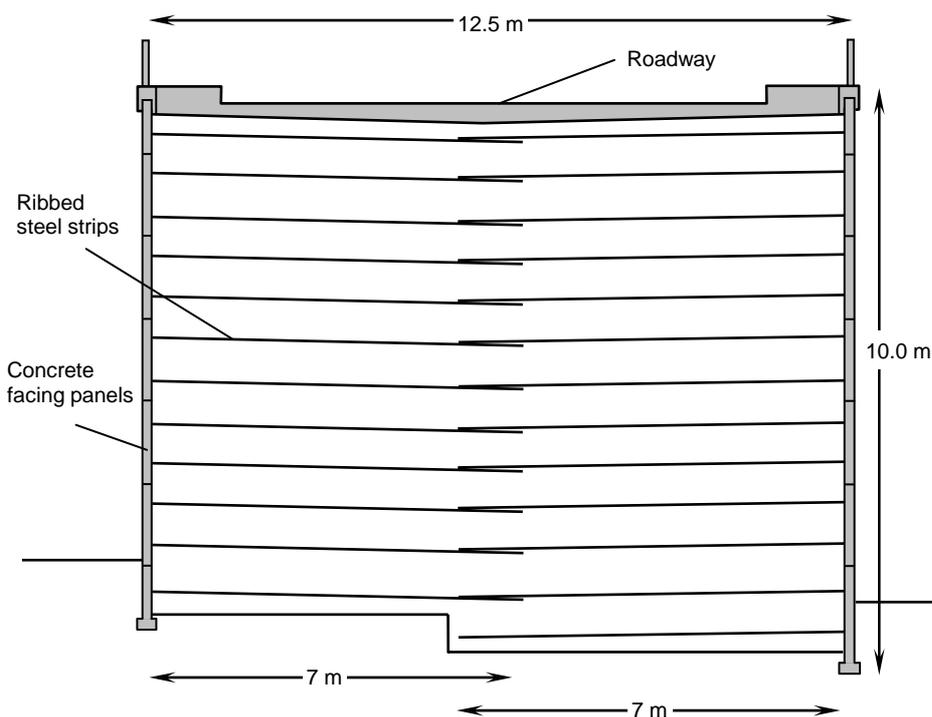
Cross-section view of the maximum section of the Arifiye RE embankment
